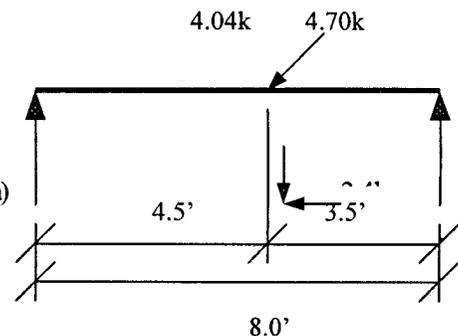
Parapet Brace Reactions at Existing 2x4 Purlin
